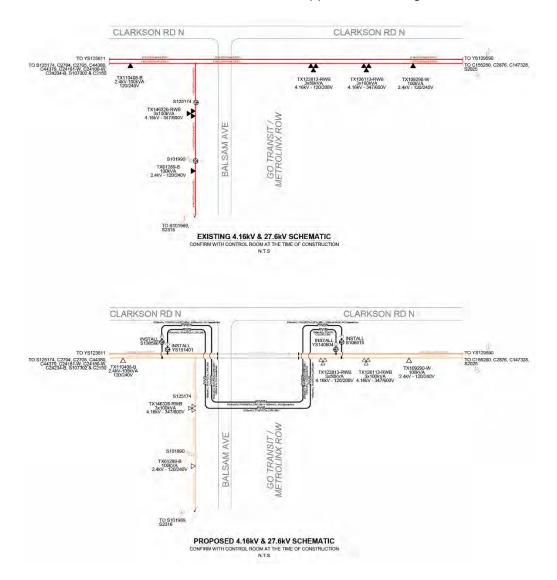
Schematic diagram showing the existing and proposed electrical lines within and adjacent to the subject site. (Source: Metrolinx GO Elec. LWL – CONFLICT #LW26 Clarkson Road North-Lakeshore Road West to Truscott Drive, Primary Schematic, Sheet No. D07-396295-001)
